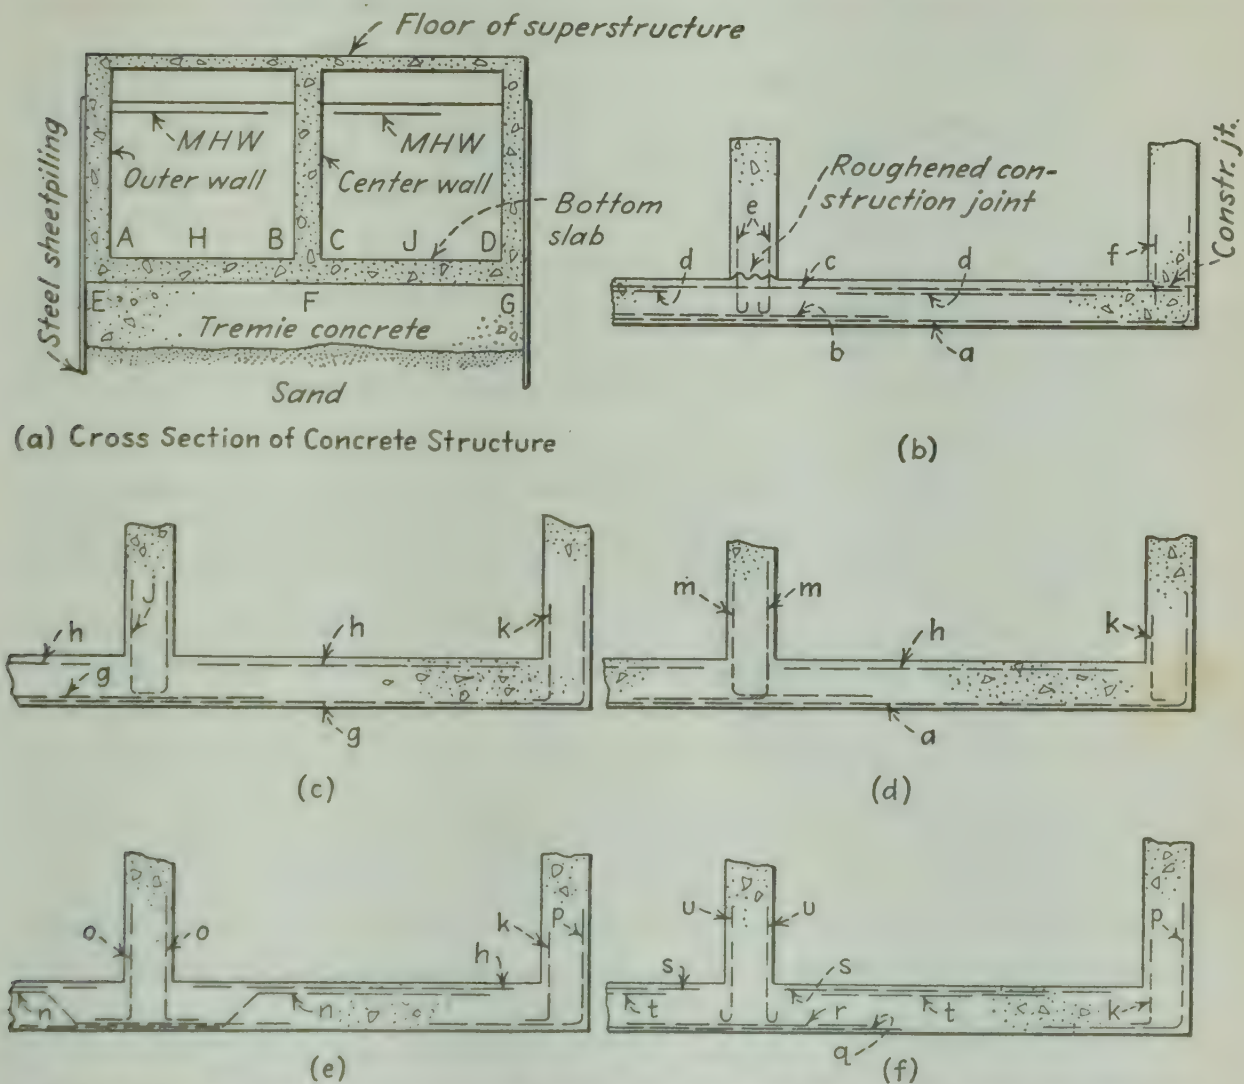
A study of arrangements of reinforcement for a heavy slab subjected to hydrostatic uplift.
